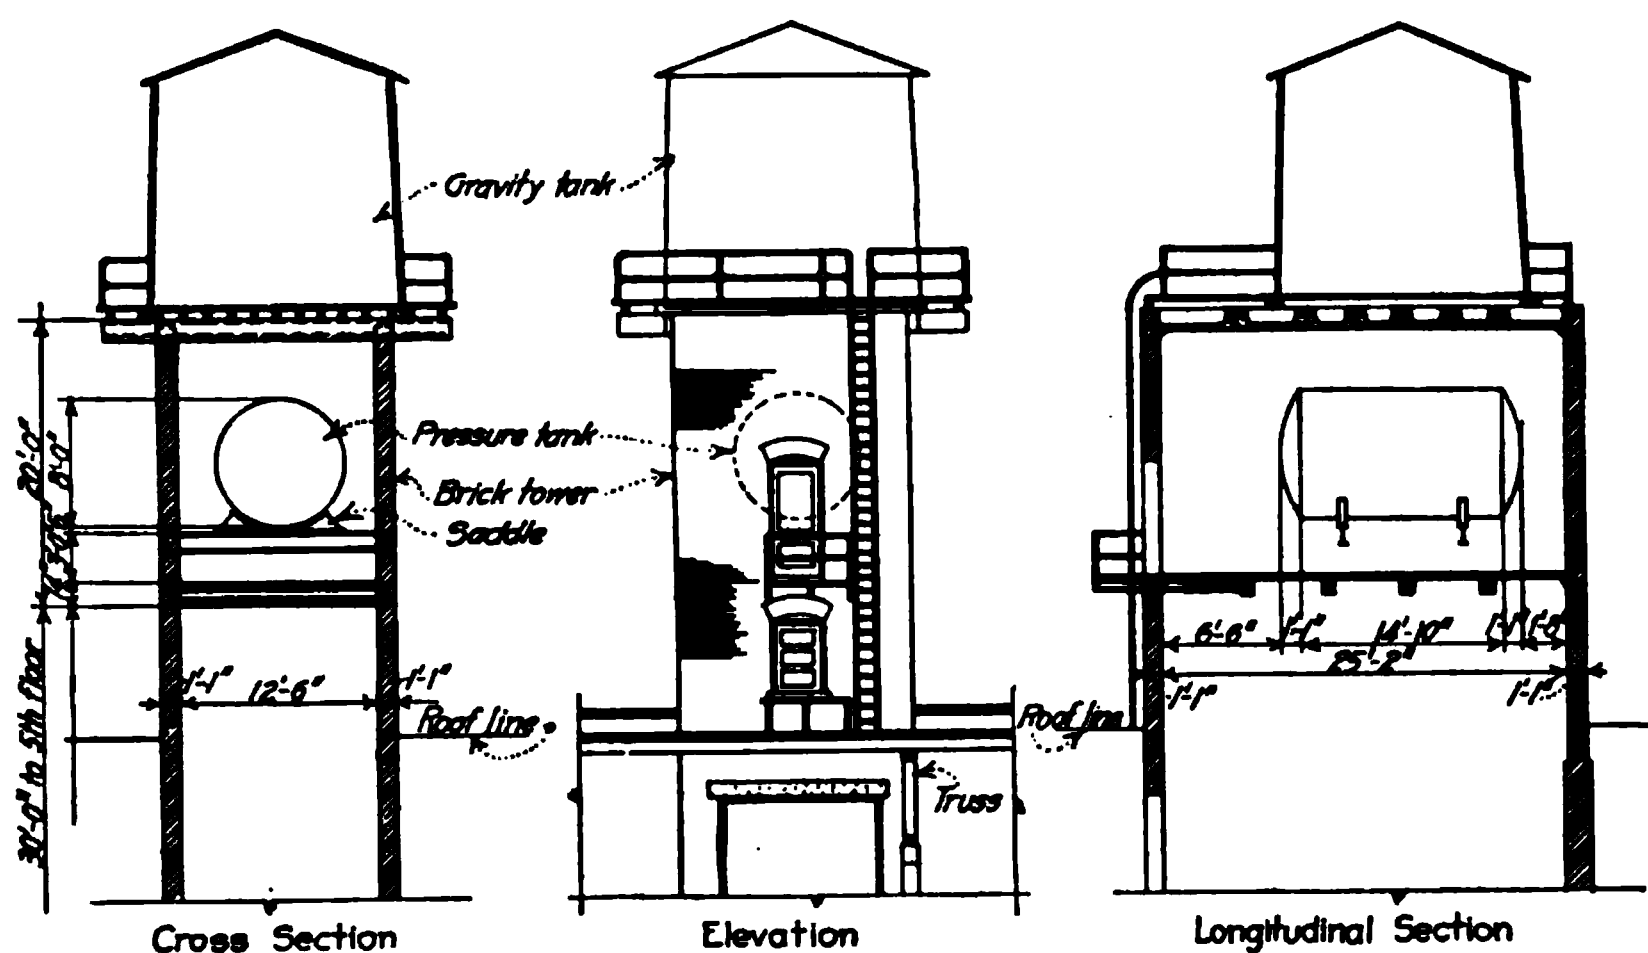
Sprinkler tank supported by brick tower which houses pressure tank over elevator shaft.
